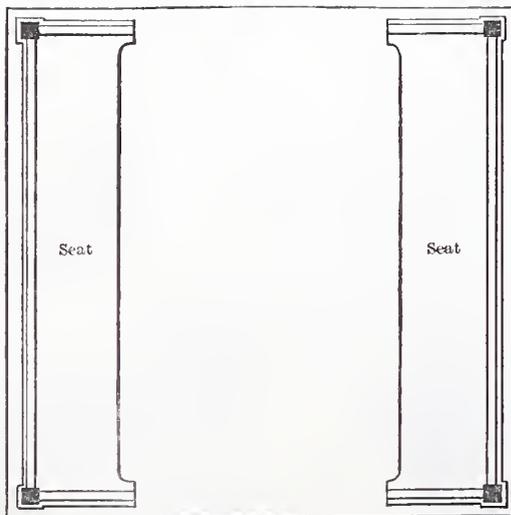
Plan.—Scale, 1/4 Inch to the Foot.
